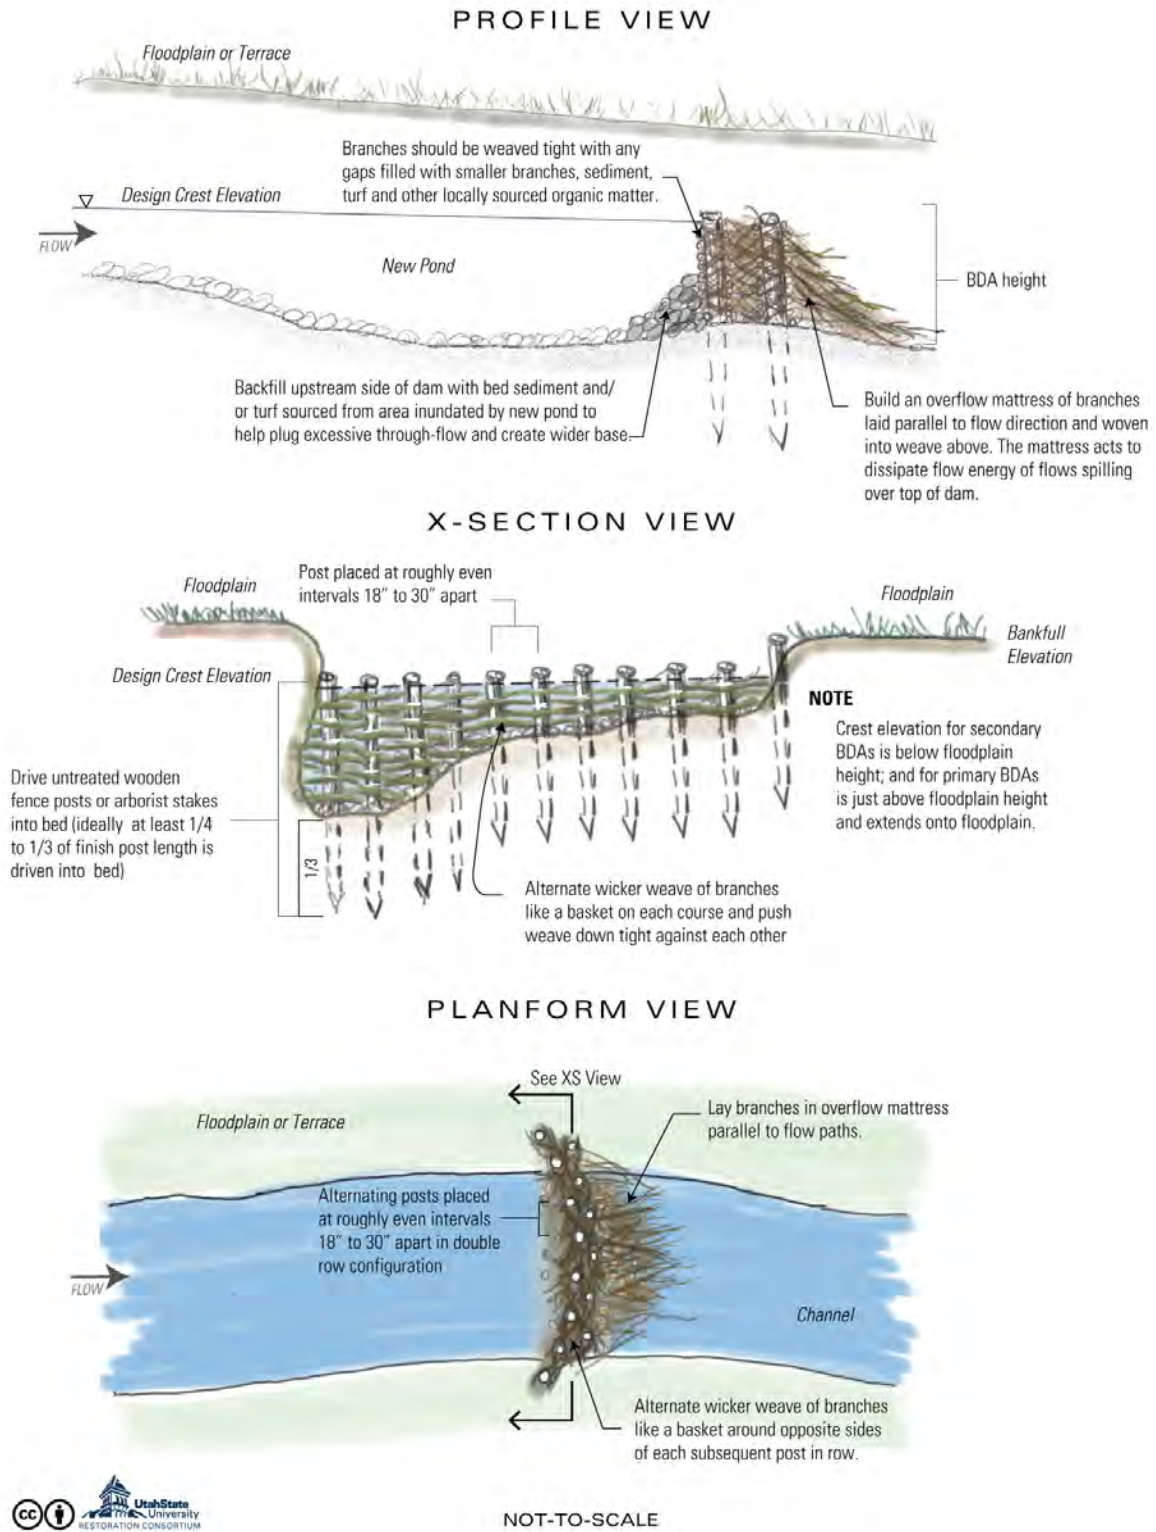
Profile, cross-sectional, and planform views of a typical BDA (from Wheaton et al. 2019).
